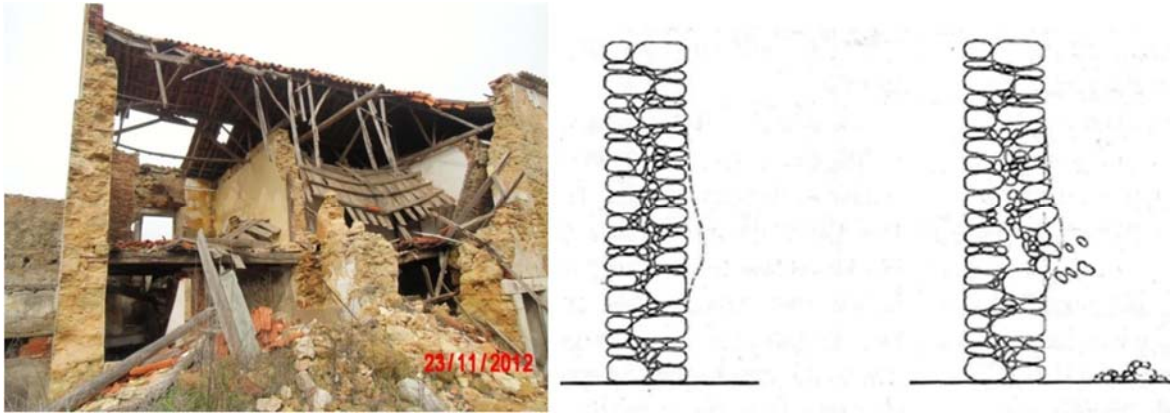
Deformation and failure of a two leaves wall due to non-monolithic behaviour (left picture); collapse of the outer leaf of the wall (right picture) (Binda et al., 2006)
